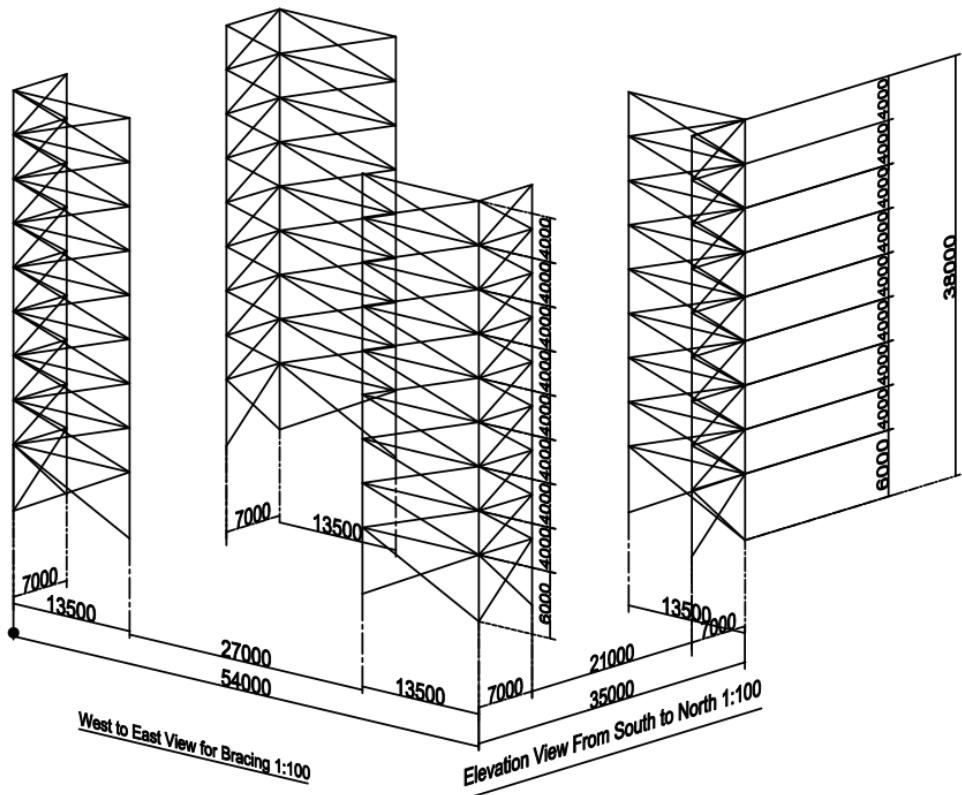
3D View for Global Bracing System in Proposal 1 (Autodesk CAD)
